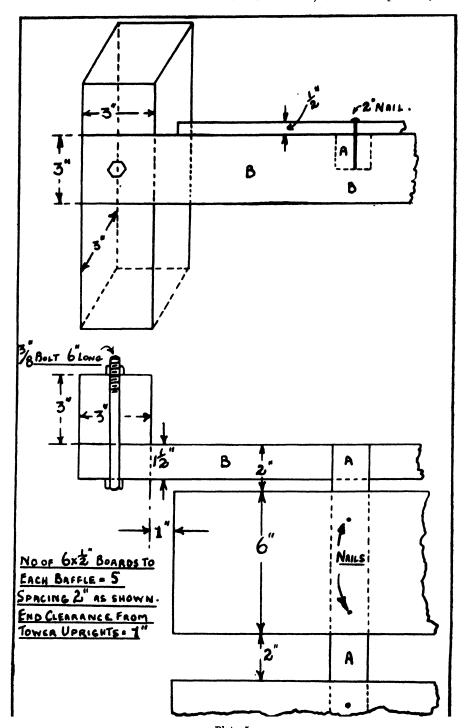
Details showing method of nailing louvres to batten strips and assembled sections to tower uprights.
